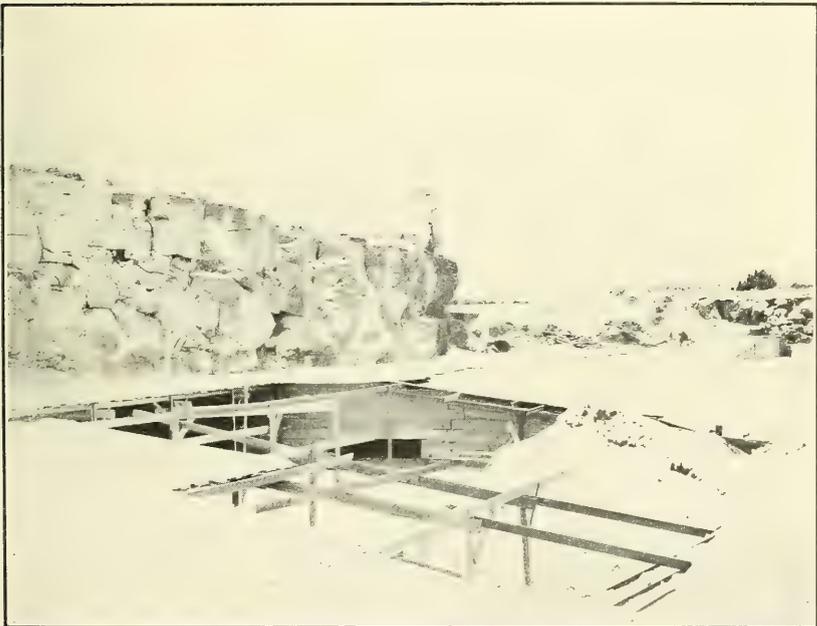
OUTSIDE VIEW OF COVERING USED FOR CANAL WHEN CONCRETE LINING WAS BEING CONSTRUCTED, NORTH SIDE TWIN FALLS LAND & WATER CO., MILNER, IDAHO.
